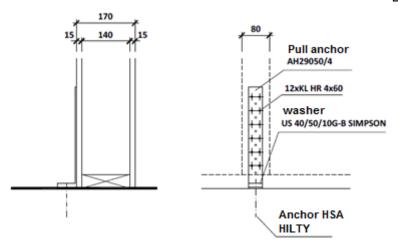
Example of anchoring to ensure required racking resistance of wall plain direction
